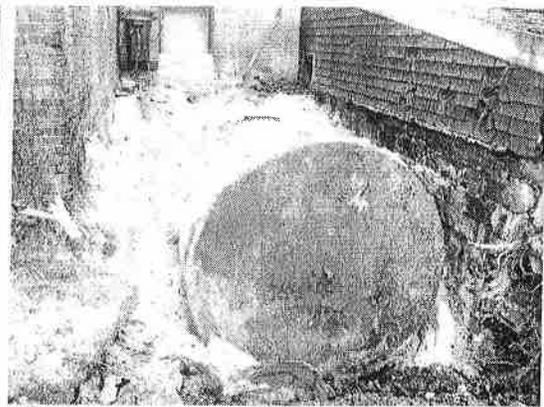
View of the UST following interior cleaning and subsequent soil excavation.
